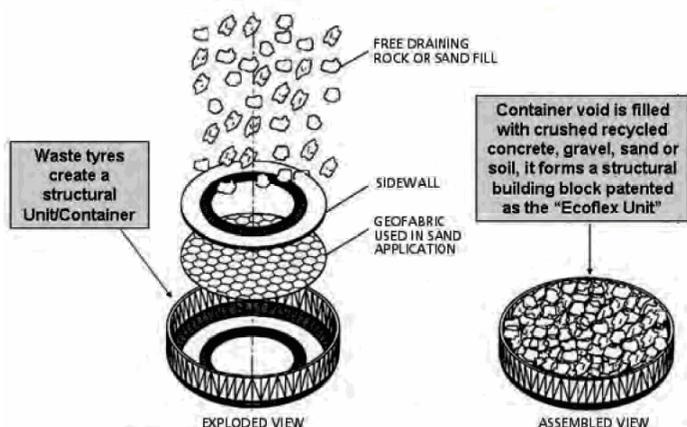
Schematic of tyre reinforced pavement (CRC Construction Innovation, 2006).
